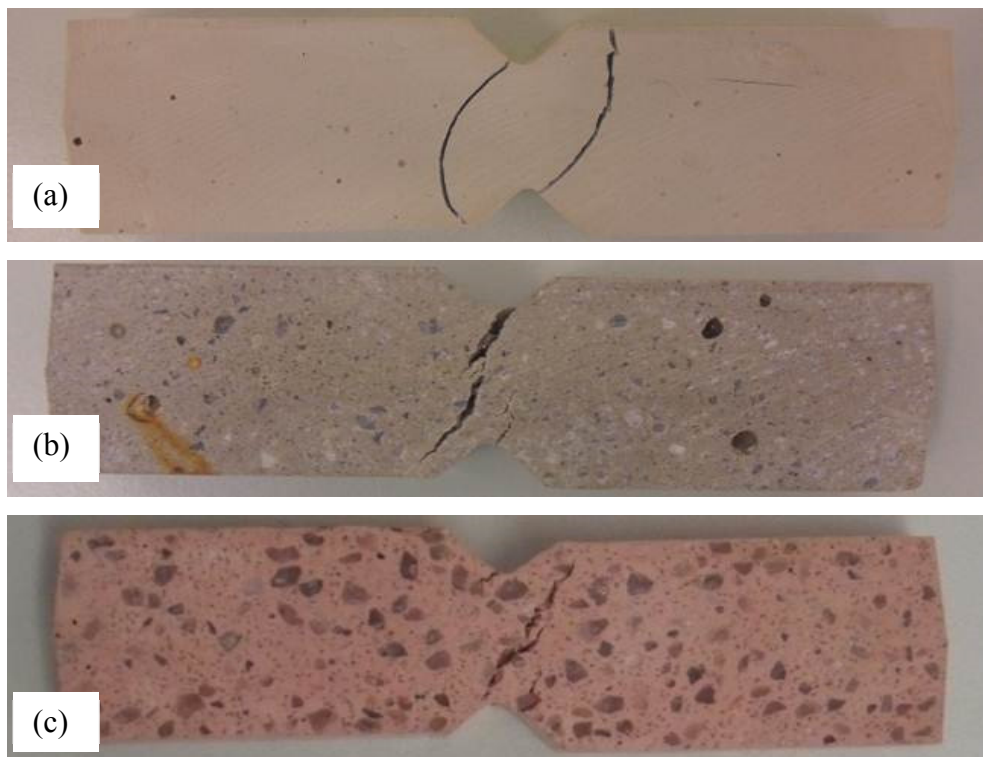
Typical failure pattern of the shear specimens; (a) grout C, (b) grout D and (c) grout E
